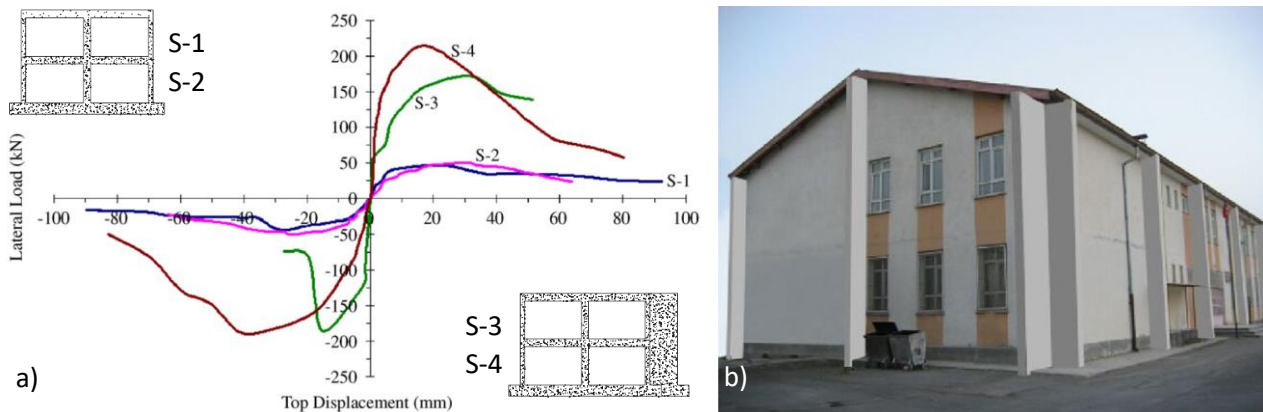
a) Load-displacement curves of each specimen; b) Rendered image of a typical school building in Turkey, strengthened with external RC shear walls – Source: [46]
